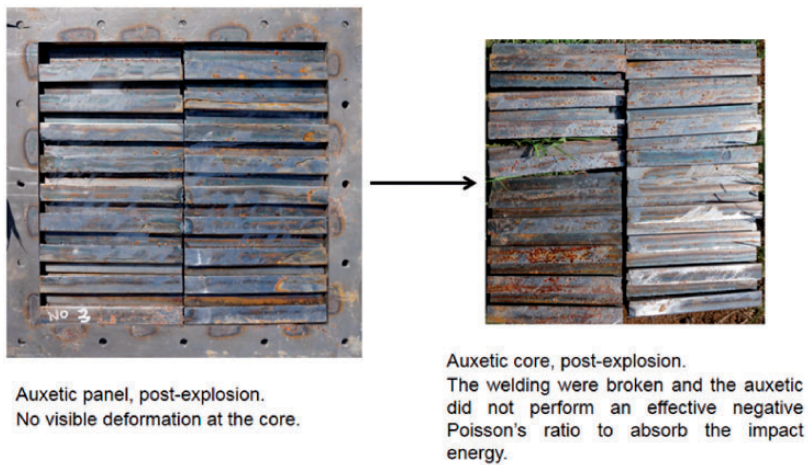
Auxetic sandwich panel post-test condition highlighting weld failure and compression of the lattice structure.
